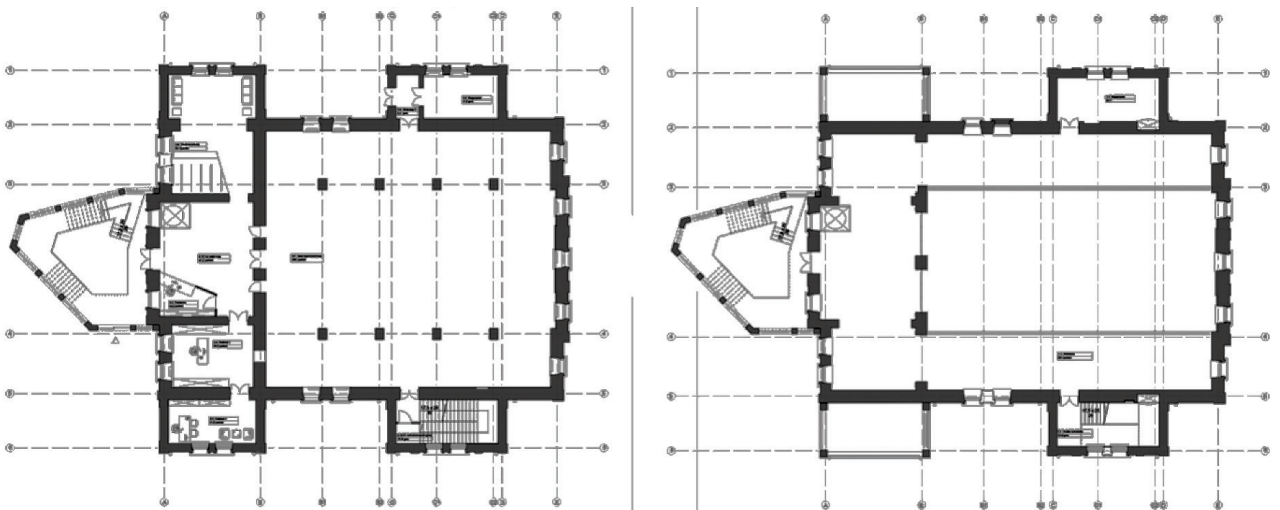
Synagogue in Kielce. Design. Drawings of individual floor plans of the building (ground floor, first floor) – design [24]
